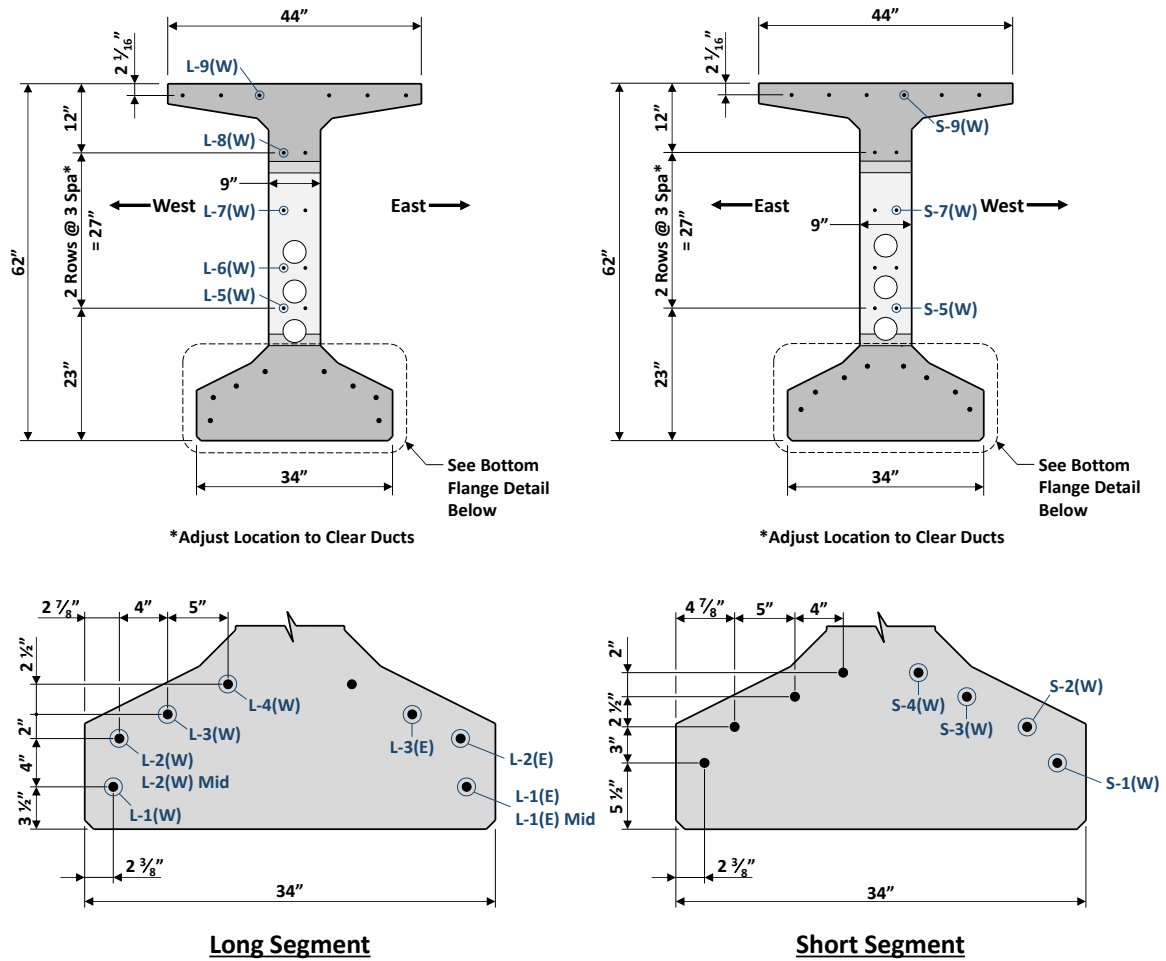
Designations of strain gauges installed on interface reinforcement – Girder 2
